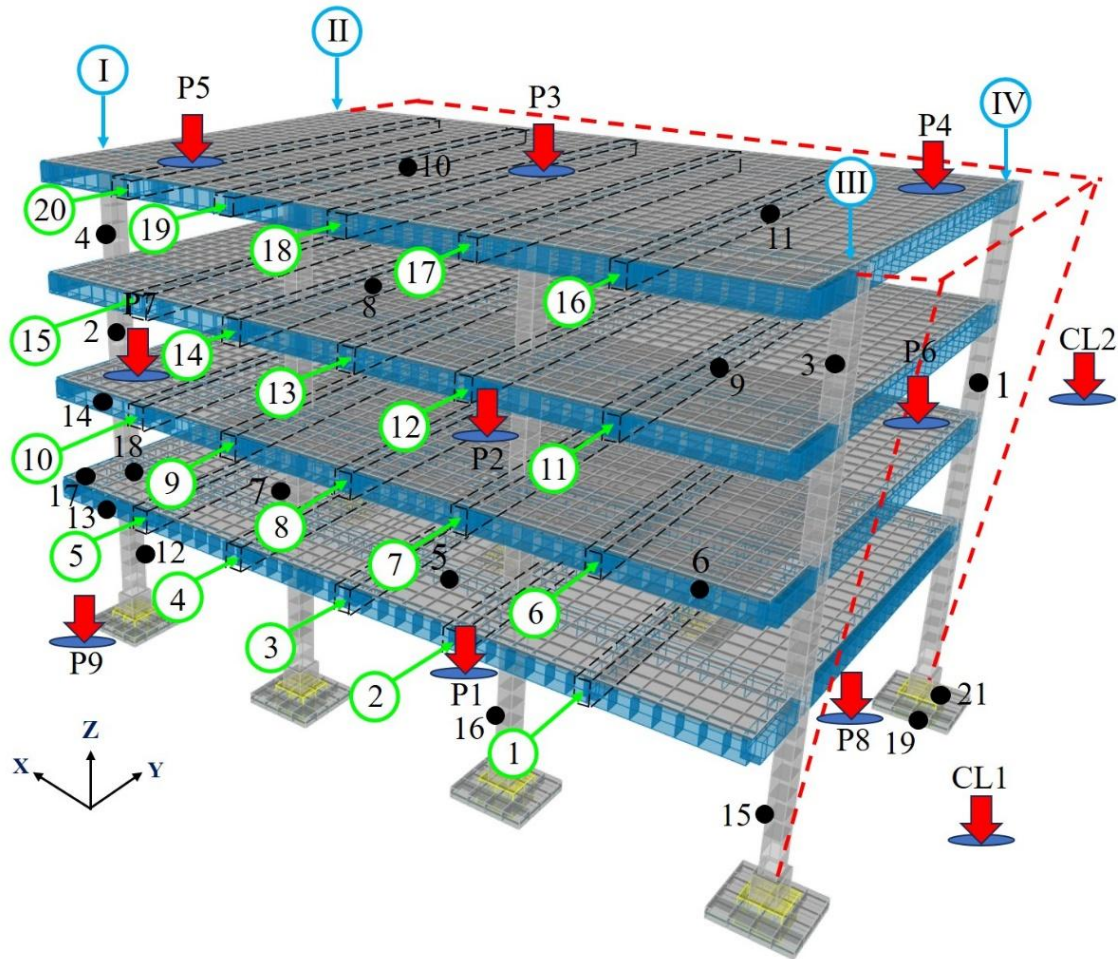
Current state (EA); location of deformations in concrete beams, loss of verticality, identification of extracted concrete cores, and ambient vibration measurement points. Where: CL represents the free field, black dots indicate concrete cores extracted to obtain E_c , green circles indicate beams with deformation, red arrows indicate the locations where accelerometers were placed, and blue circles with Roman numerals indicate the reference axes for measuring loss of verticality.
